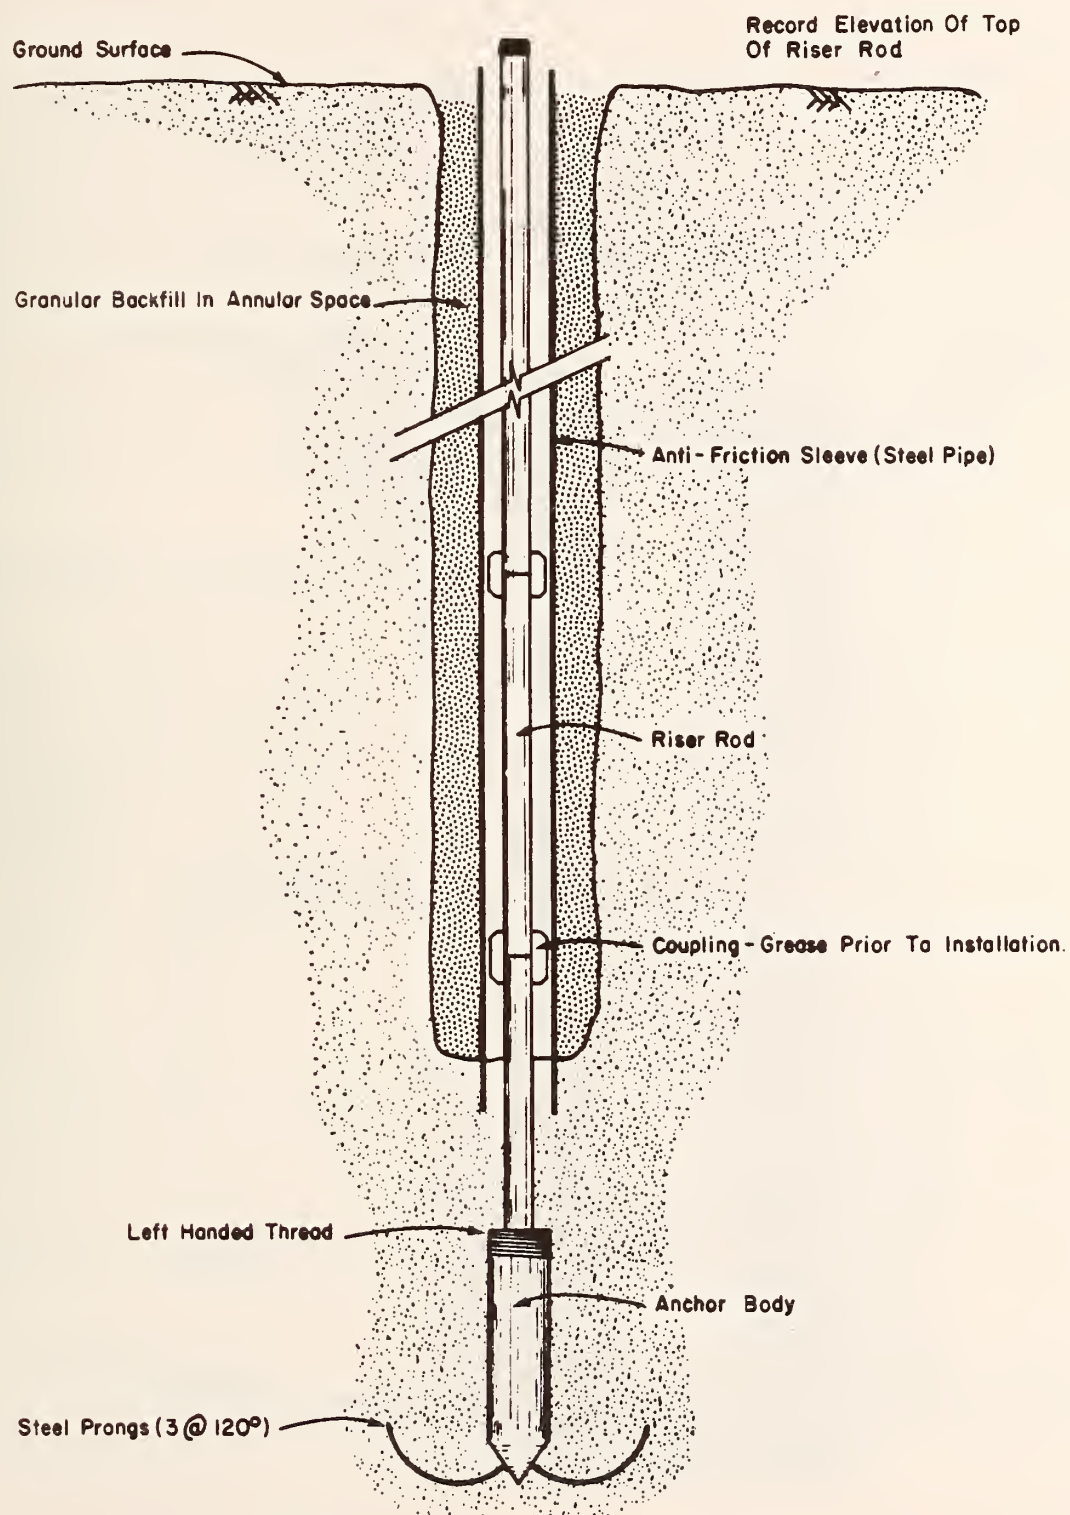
Schematic of a Deep Settlement Monitoring Anchor
